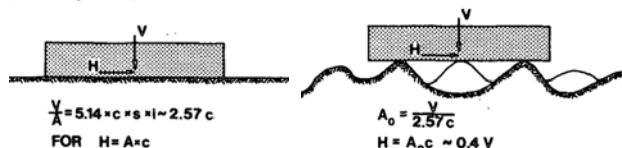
Inclined and centrally loaded strip footing on clay till (After Figure 10 from Mortensen (1983)).
